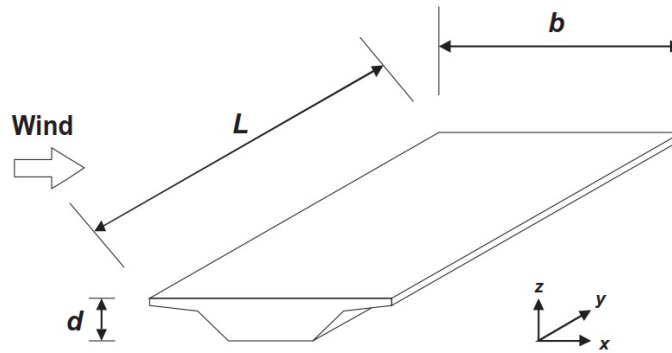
Directions of the wind force on a bridge girder [NEN-EN 1991-1-4, 2005]
